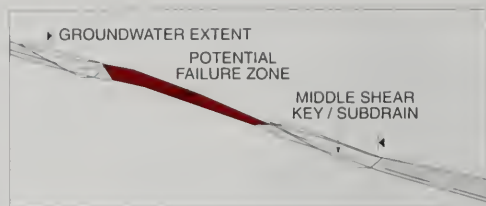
Slope stability modeling of backcut failure potential of recommended middle subdrain key.
